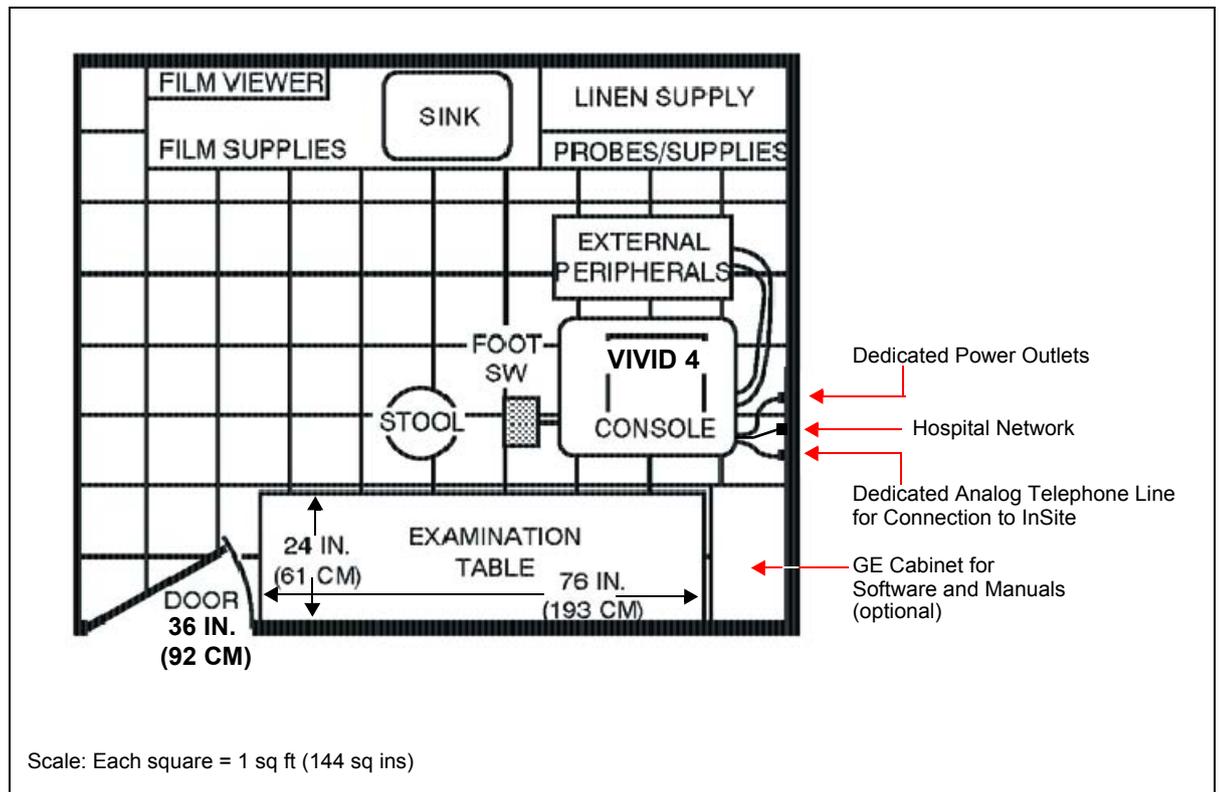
Minimal Floor Plan 2.5m x 3m (8.2ft x 9.84 ft)
